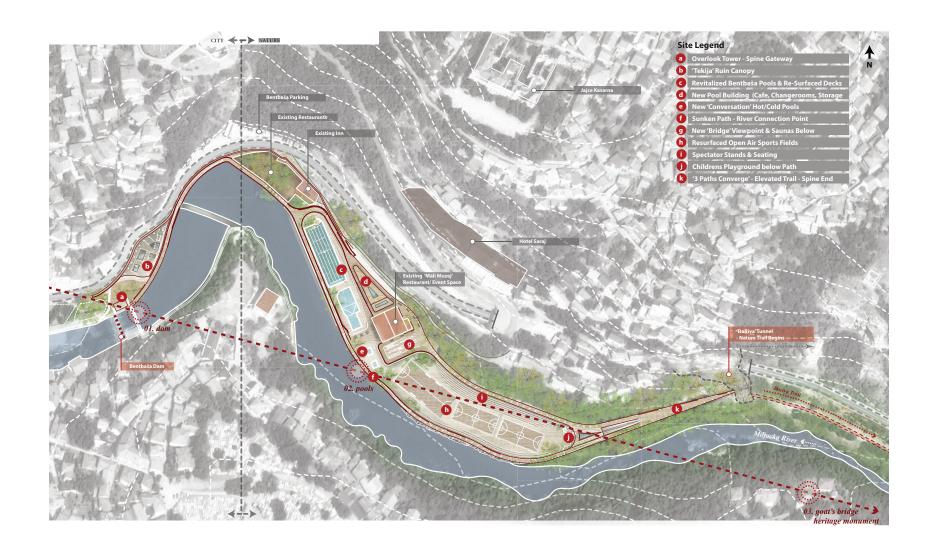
The New Bentbaša Spine, Proposed Site Plan
